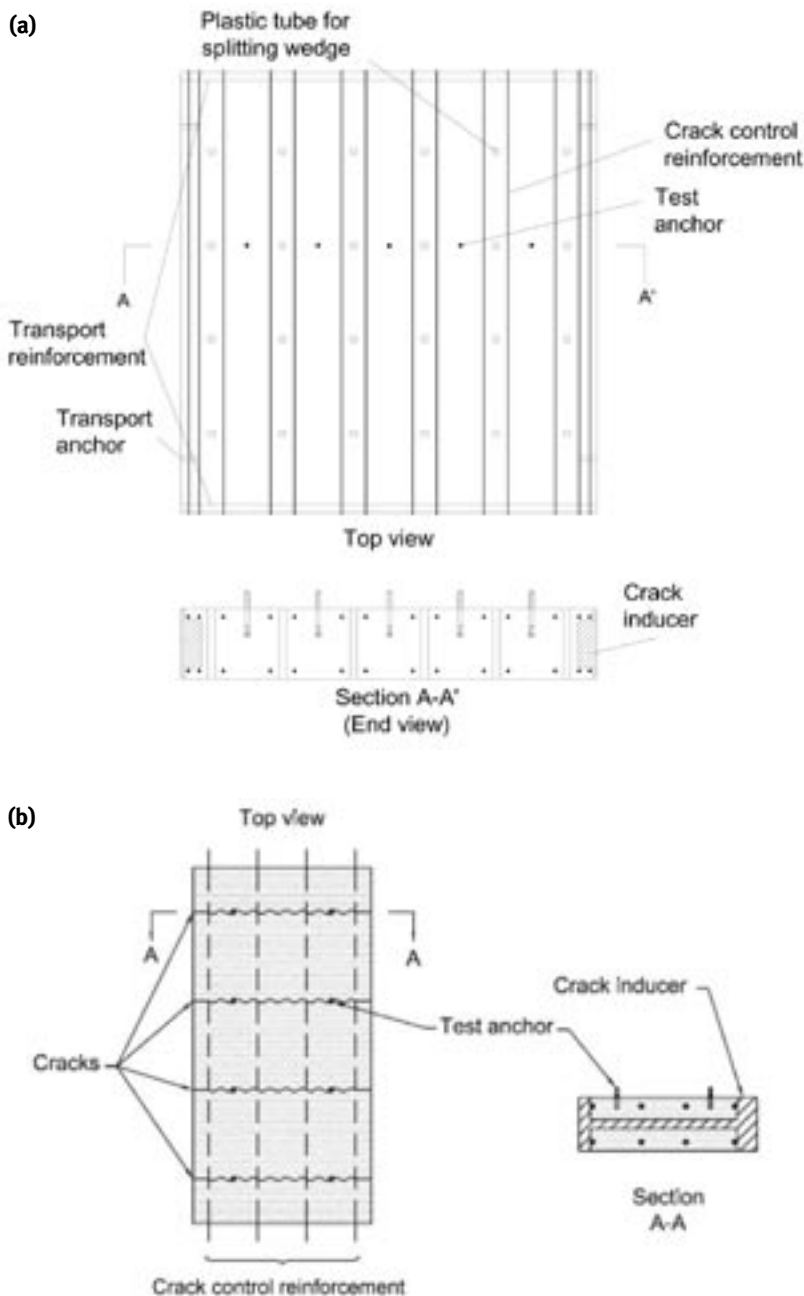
Typical test members for testing anchors in cracked concrete: (a) cracks generated by splitting wedges; and (b) cracks generated by pulling on the reinforcement
